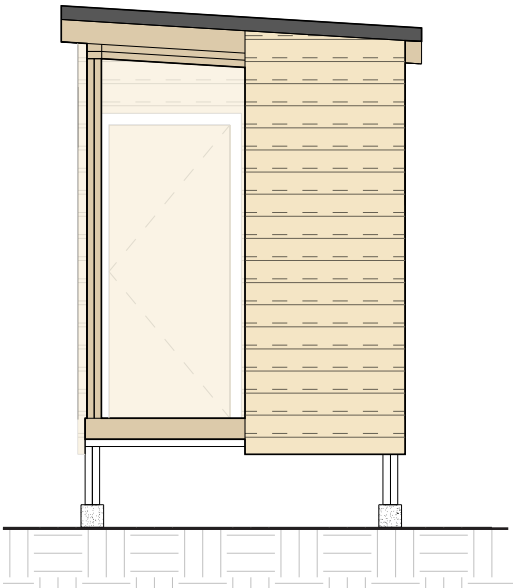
ELEVATION C-C OF THE BUILT CABIN.
